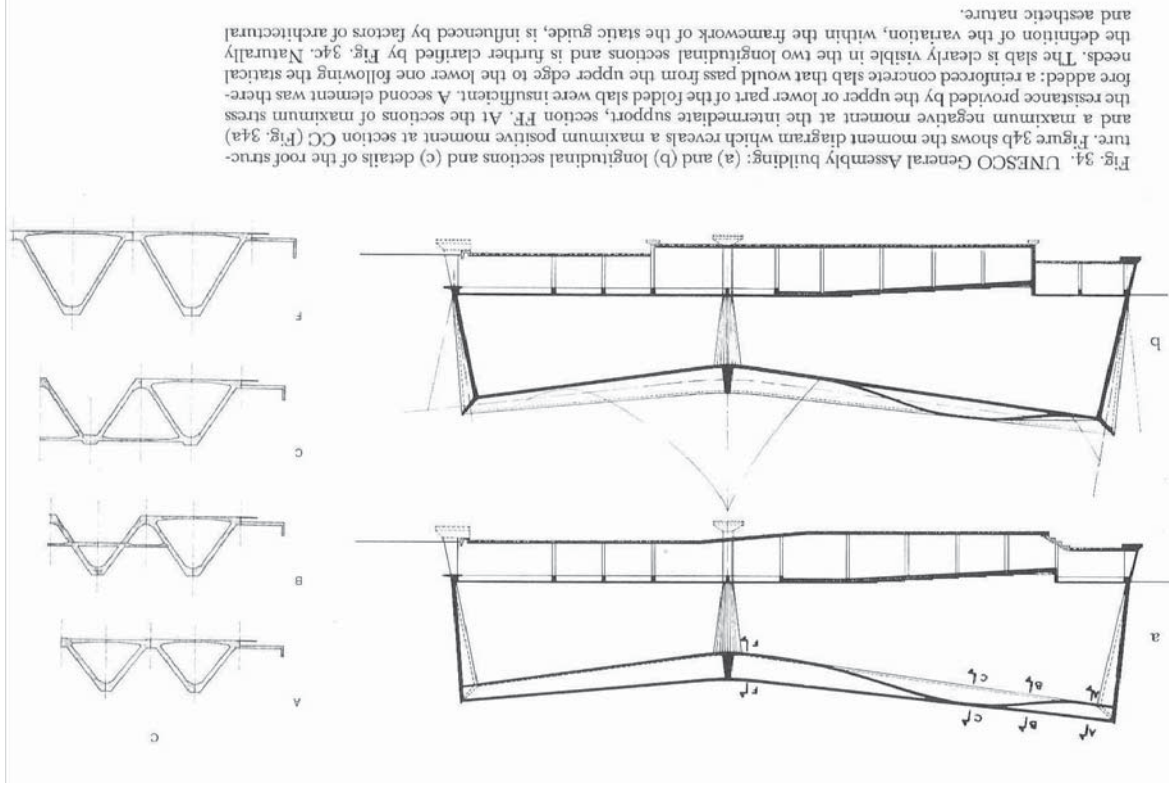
UNESCO General Assembly building: (a) and (b) longitudinal sections and (c) details of the roof structure. Figure 34b shows the moment diagram which reveals a maximum positive moment at section CC (Fig. 34a) and a maximum negative moment at the intermediate support, section FF. At the sections of maximum stress and a maximum negative moment from the upper part of the folded slab were insufficient. A second element was therefore added: a reinforced concrete slab that would pass from the upper edge to the lower one following the static needs. The slab is clearly visible in the two longitudinal sections and is further clarified by Fig. 34c. Naturally the definition of the variation, within the framework of the static guide, is influenced by factors of architectural and aesthetic nature.
